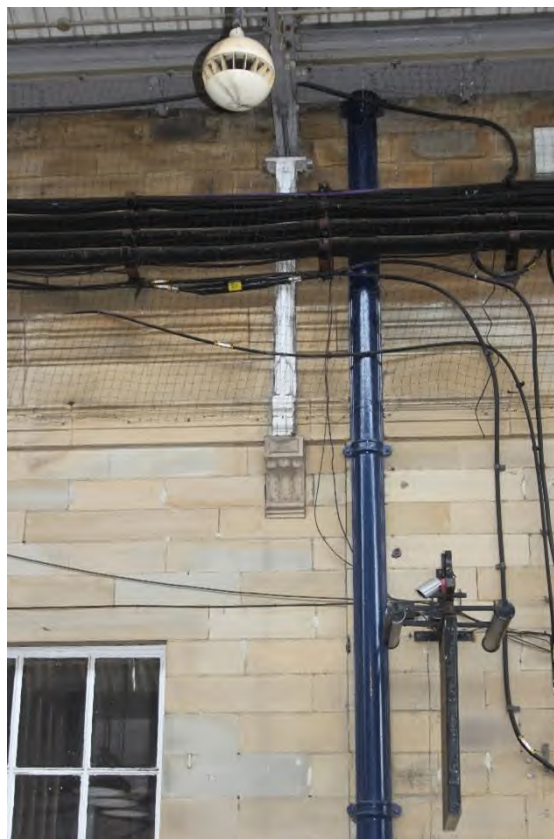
Wall join at the southern end of the eastern elevation (left of down-pipe), facing east
